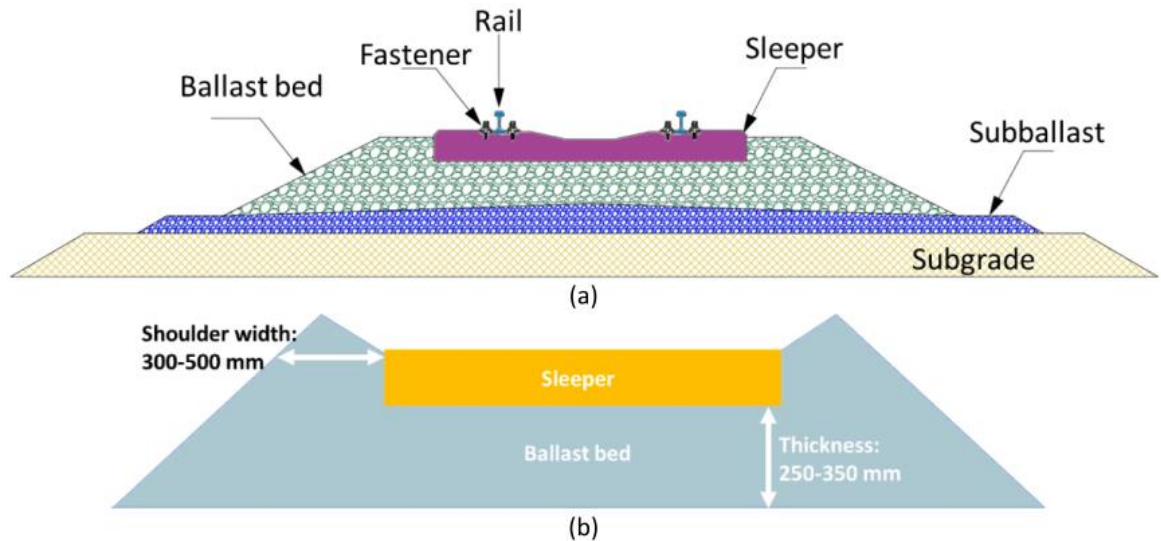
Ballasted railway track (a) track components (b) transversal cross-section of ballast (modified after Guo et al. (2022))
